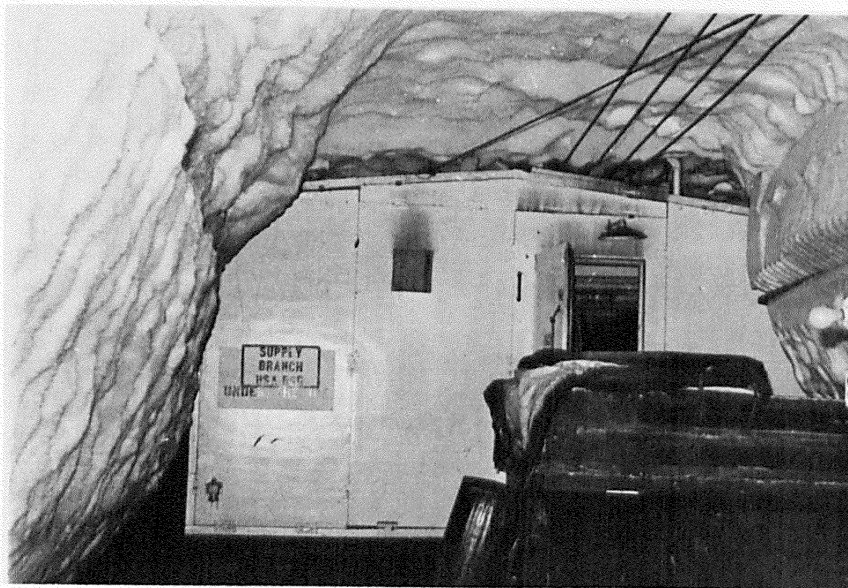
Snow load on roof and walls causes T-5 end wall panels to pull apart.
